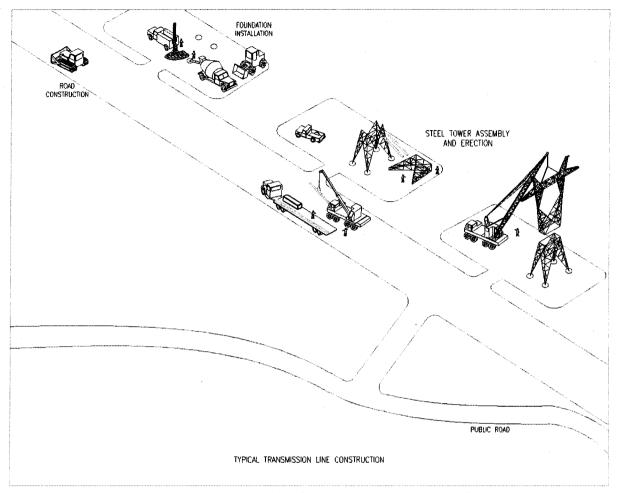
Foundation Installation, Structure Assembly, and Structure Erection
